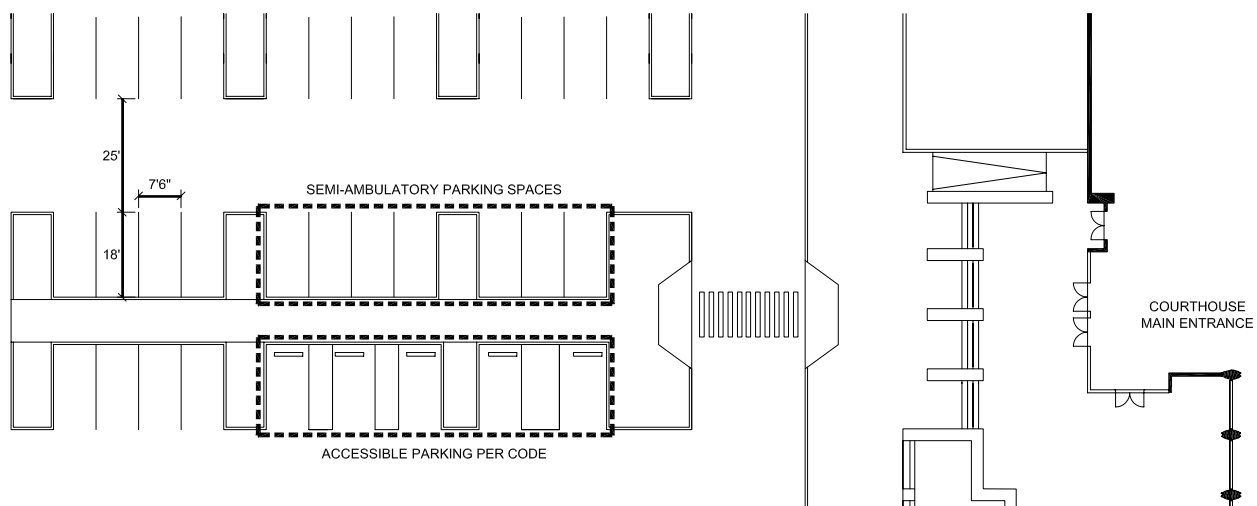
Parking Layout Showing Location of Accessible and Semi-Ambulatory Spaces
